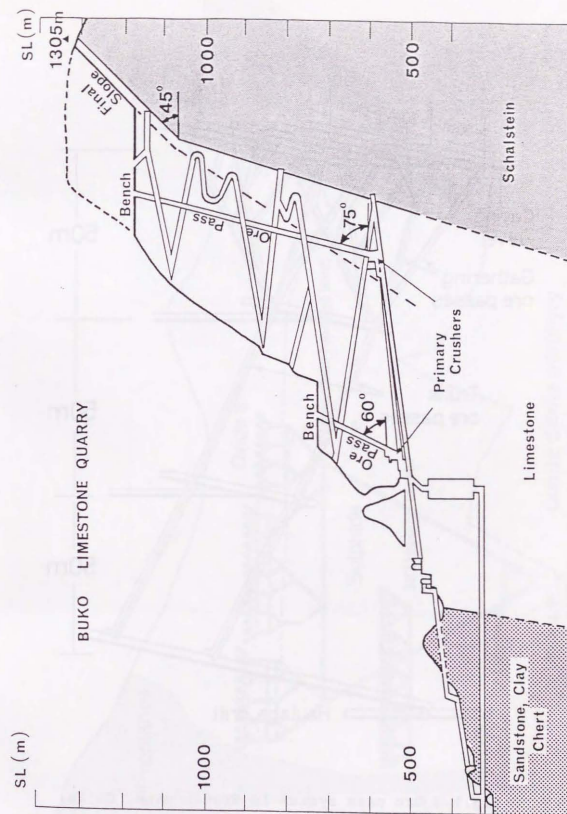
Typical bench cut with an ore pass and tunnel haulage system.
